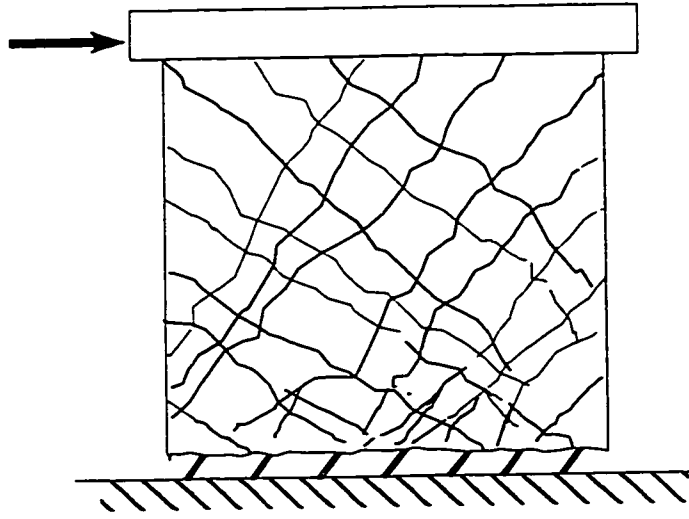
Sliding shear failure mode in low-rise R/C walls
